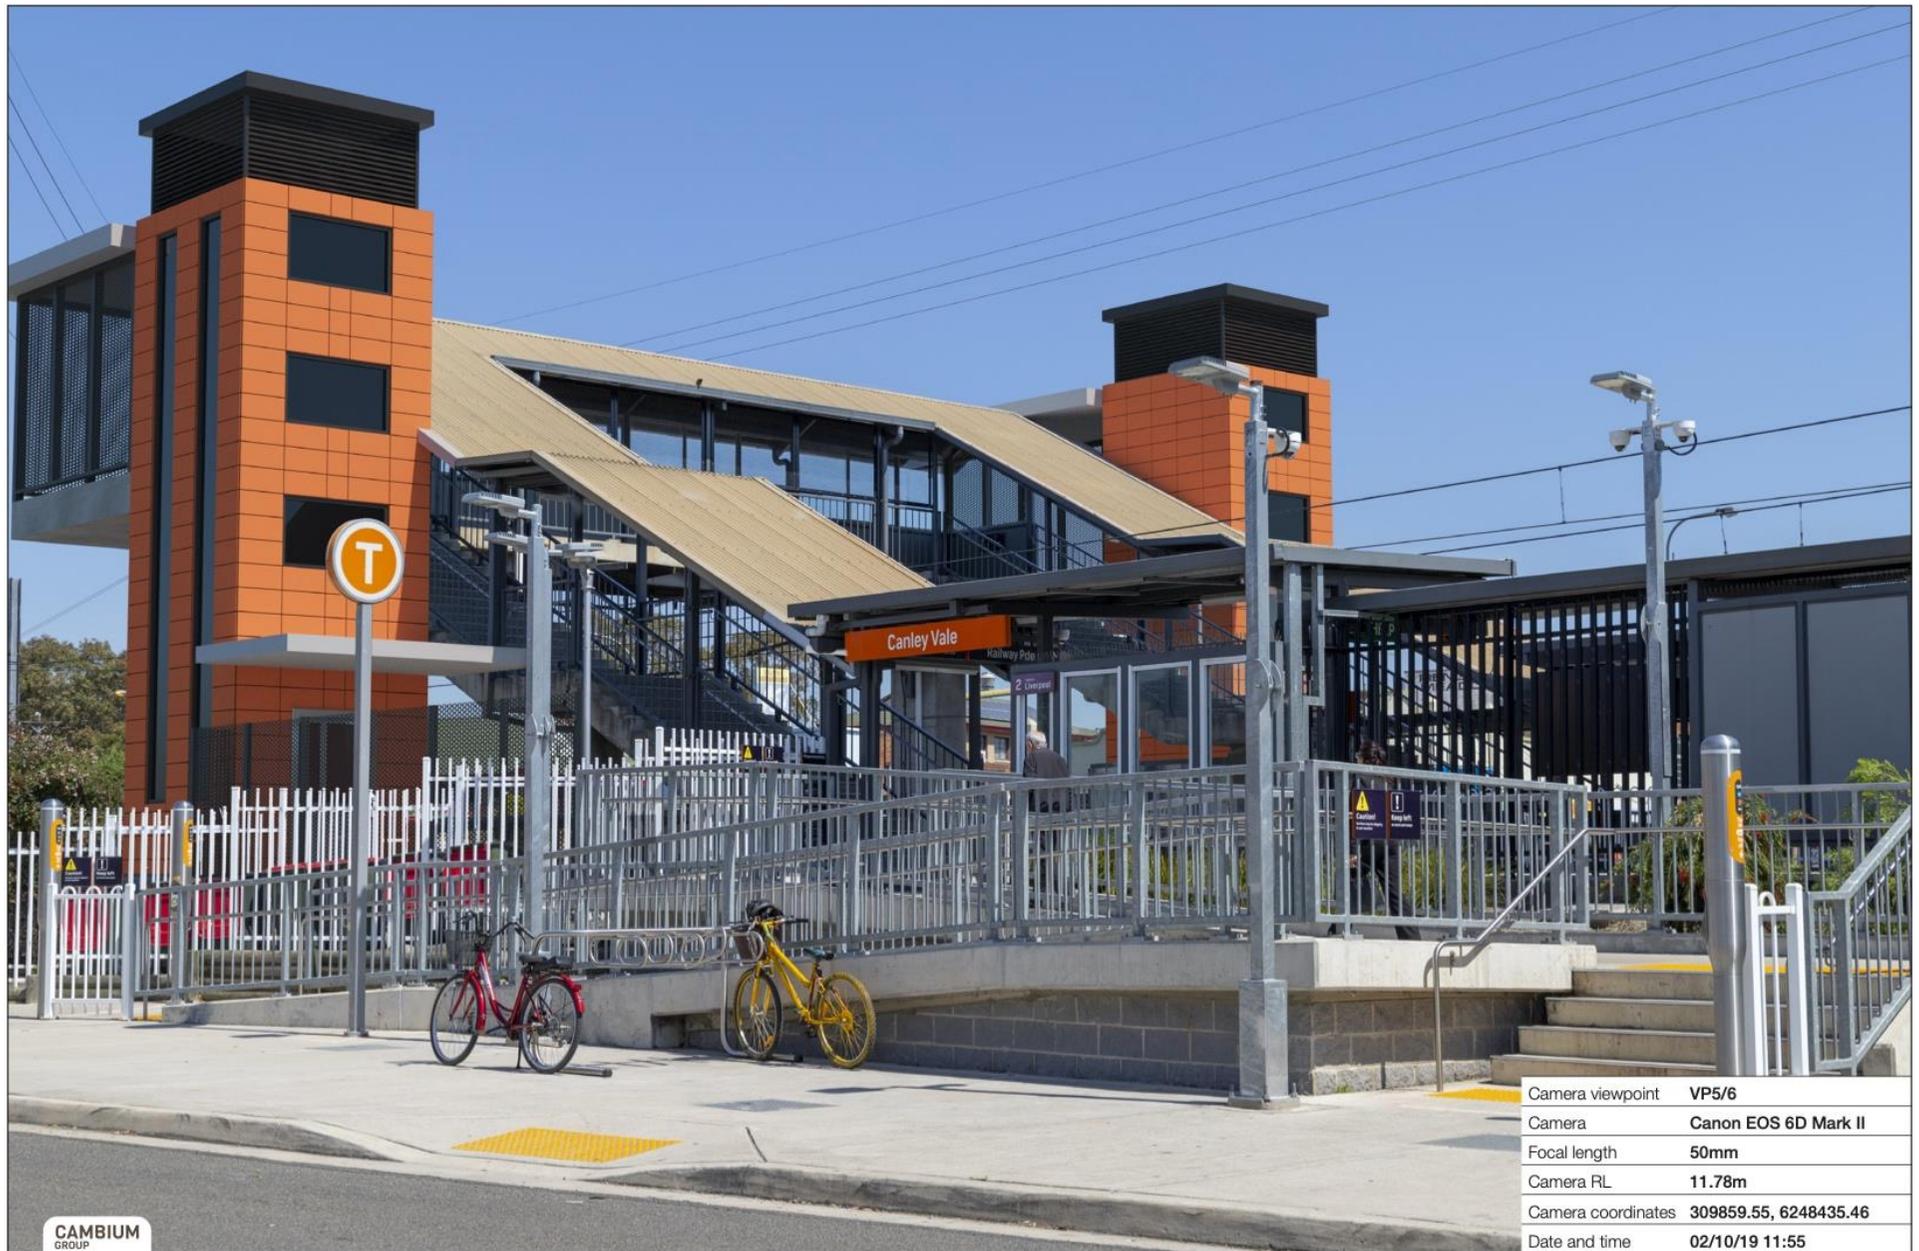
VP5/6 – PHOTOMONTAGE POST-CONSTRUCTION
